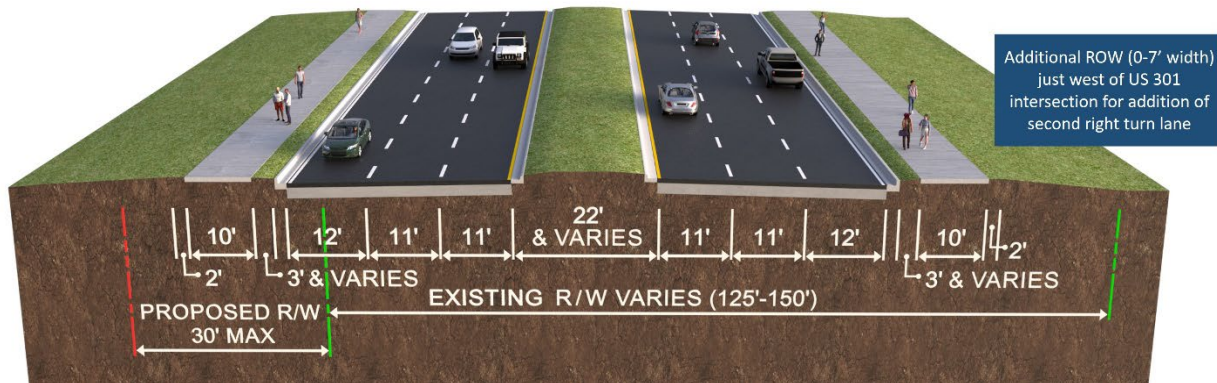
Gibsonton Drive – Proposed Typical Section
